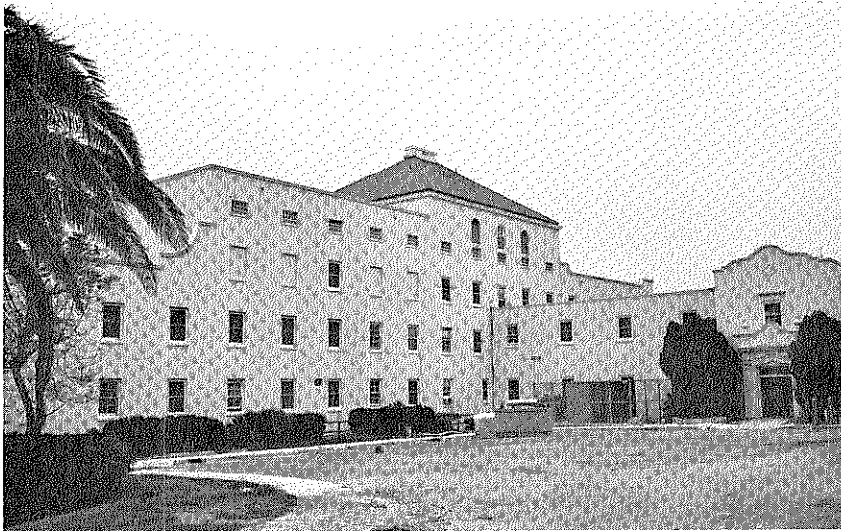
Reinforced concrete building at Veterans Administration Hospital, constructed to resist earthquakes, survived the ground shaking with no significant damage.
